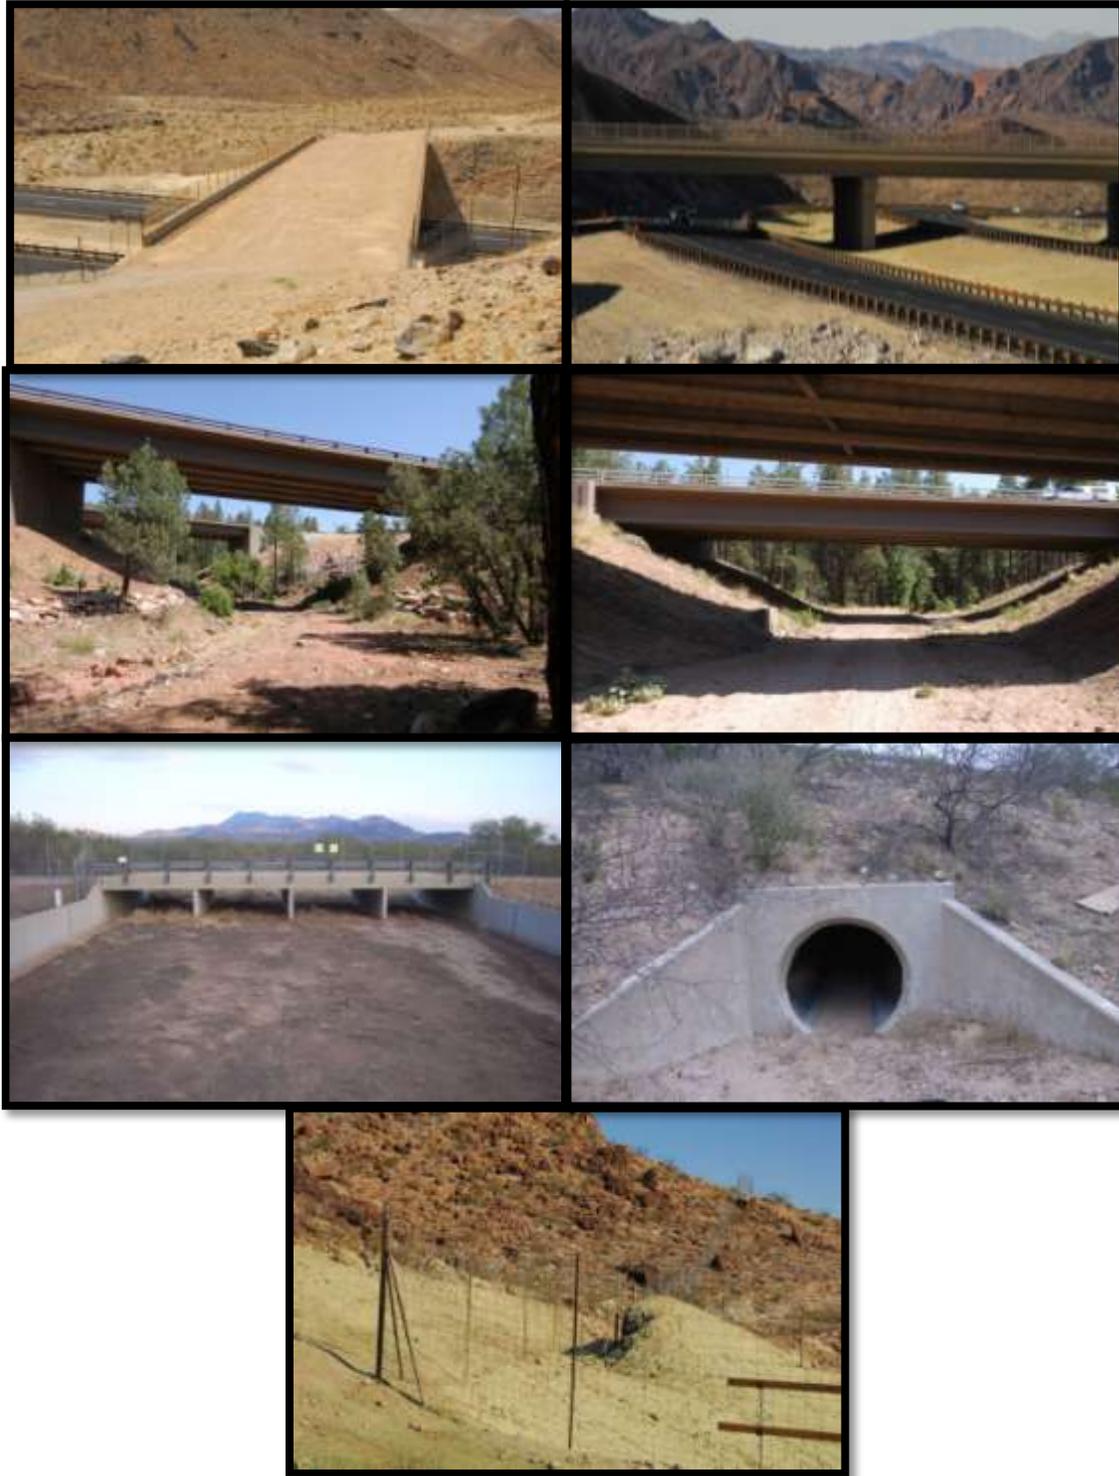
Potential road mitigations (from top to bottom) include: highway overpasses, bridges, culverts, and drainage pipes. Fencing (bottom) should be used to guide animals into crossing structures (Photographs courtesy George Andrejko and Dean Pokrajac, AGFD)
